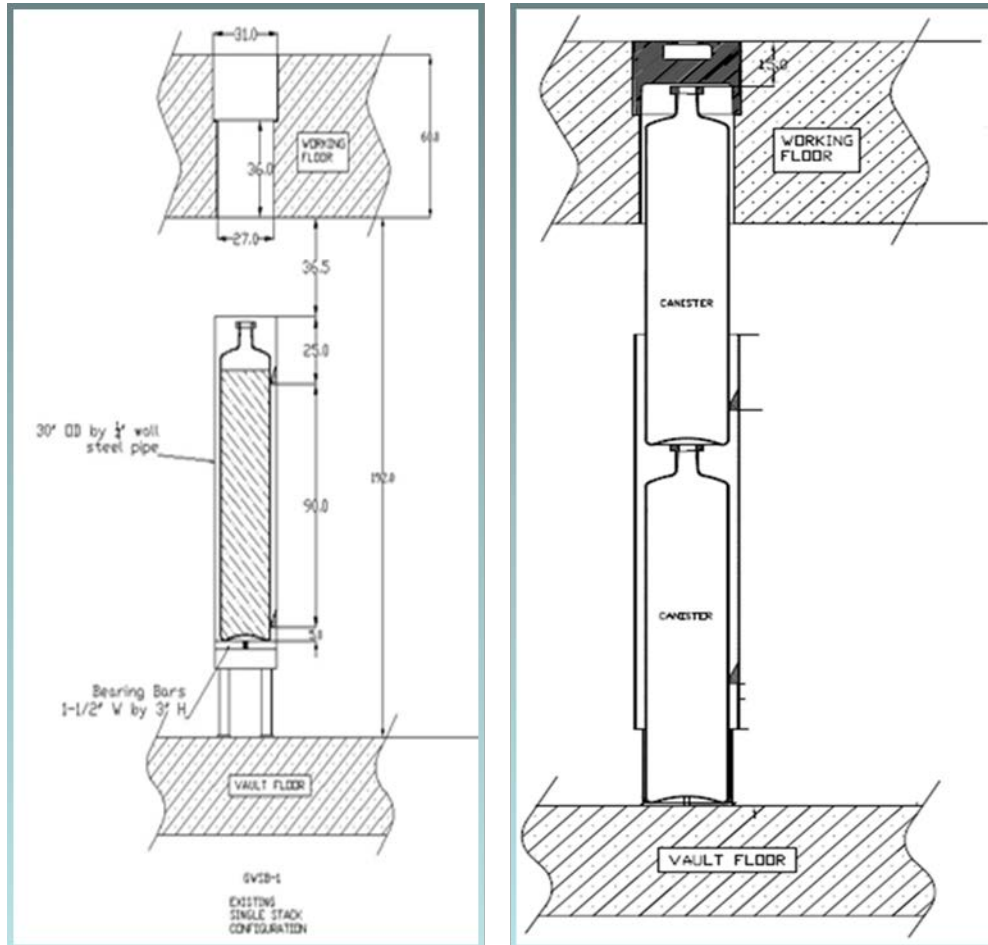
Original Design (Left) and Modified Design (Right) of the Glass Waste Storage Building #1.
